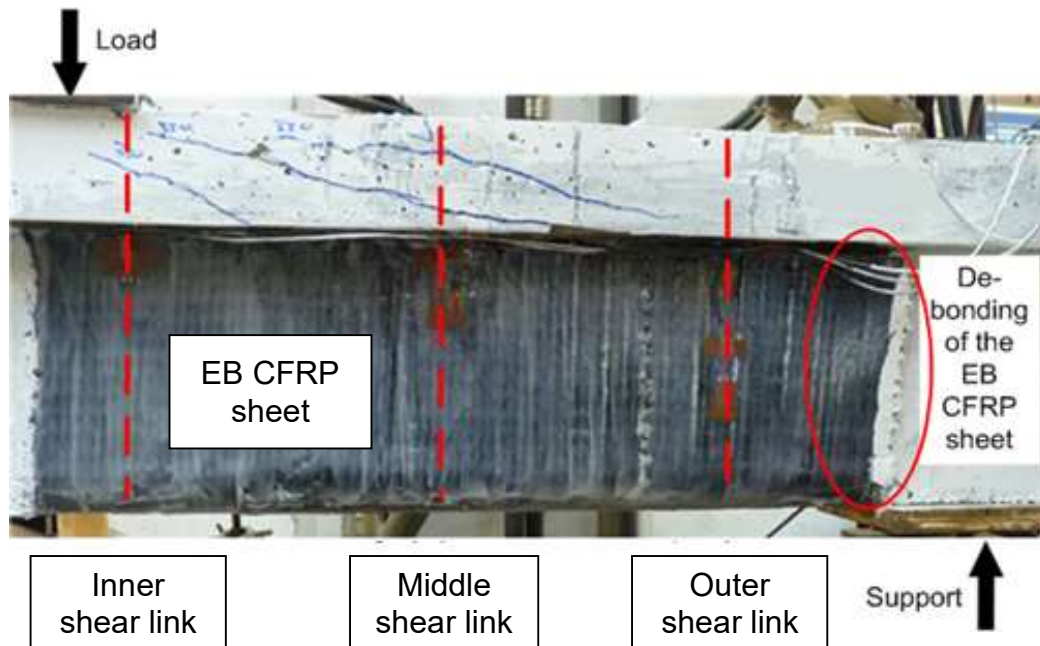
Typical failure mode of the EB CFRP sheet strengthened beams
